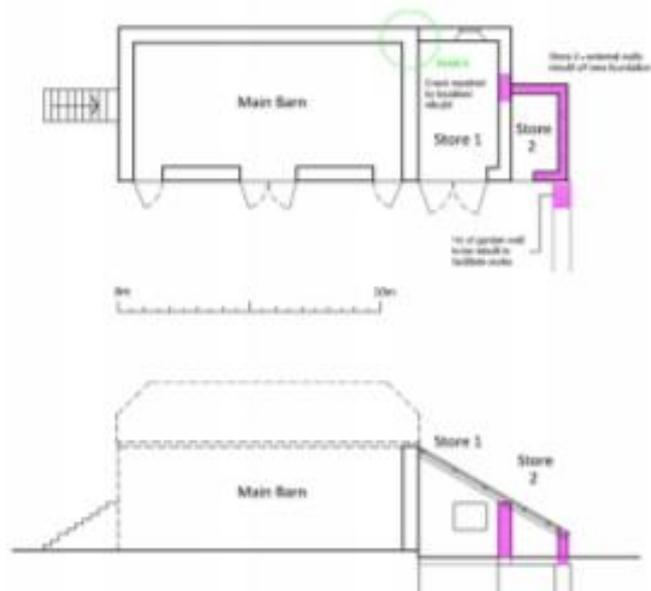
Plan of barn and stores, showing the extent of the proposed superstructure repairs
